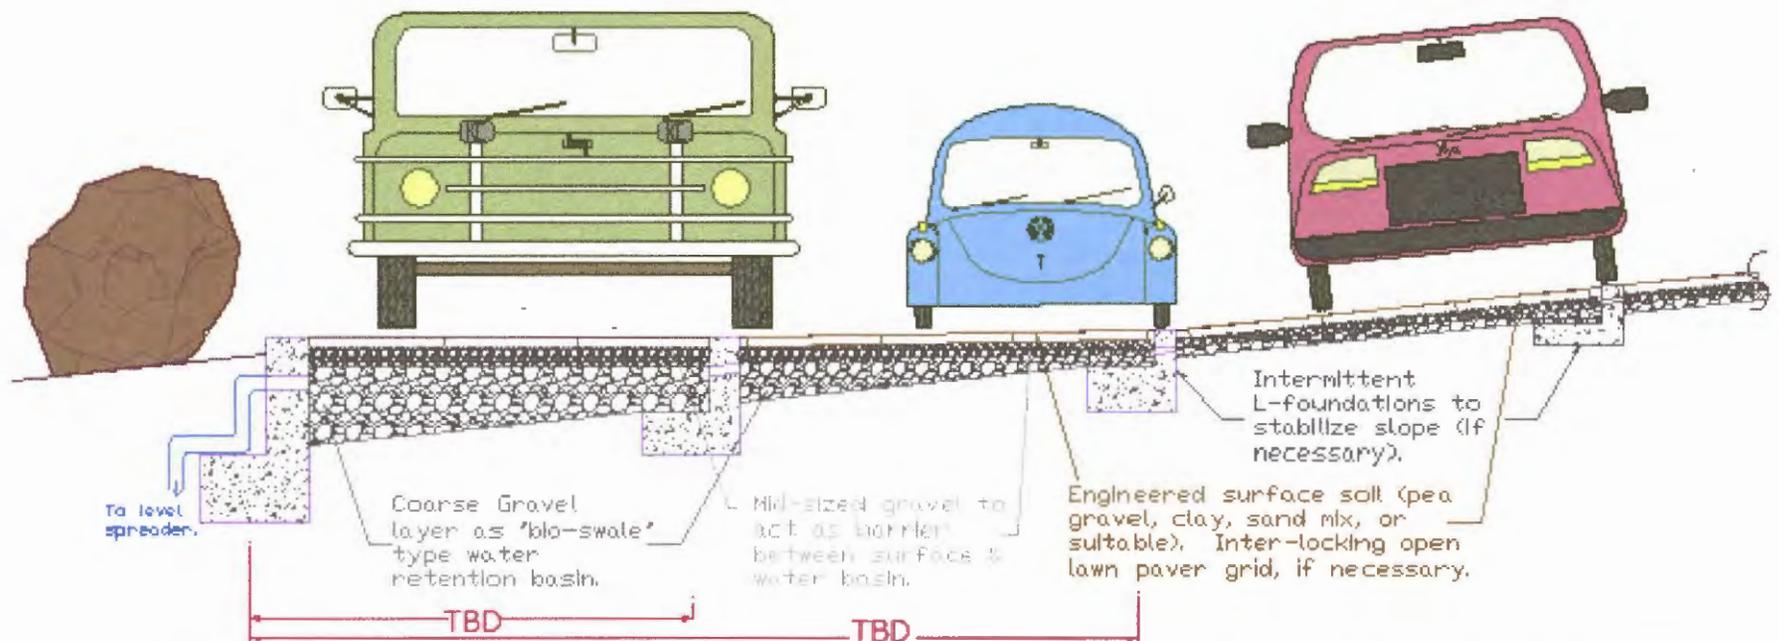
SOUTH END OF PARKING AREA (LOOKING WEST), SHOWING PARKING ON “BIO-SWALE”-STYLE DESIGN CONCEPT
